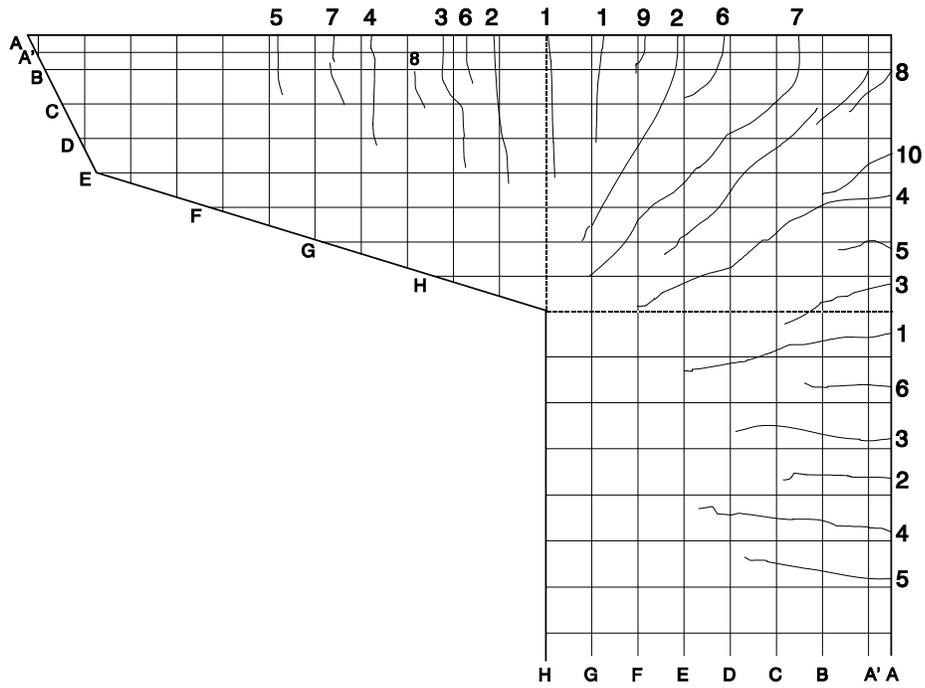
POJ-RC-100 cracking pattern on south face of specimen at service load
